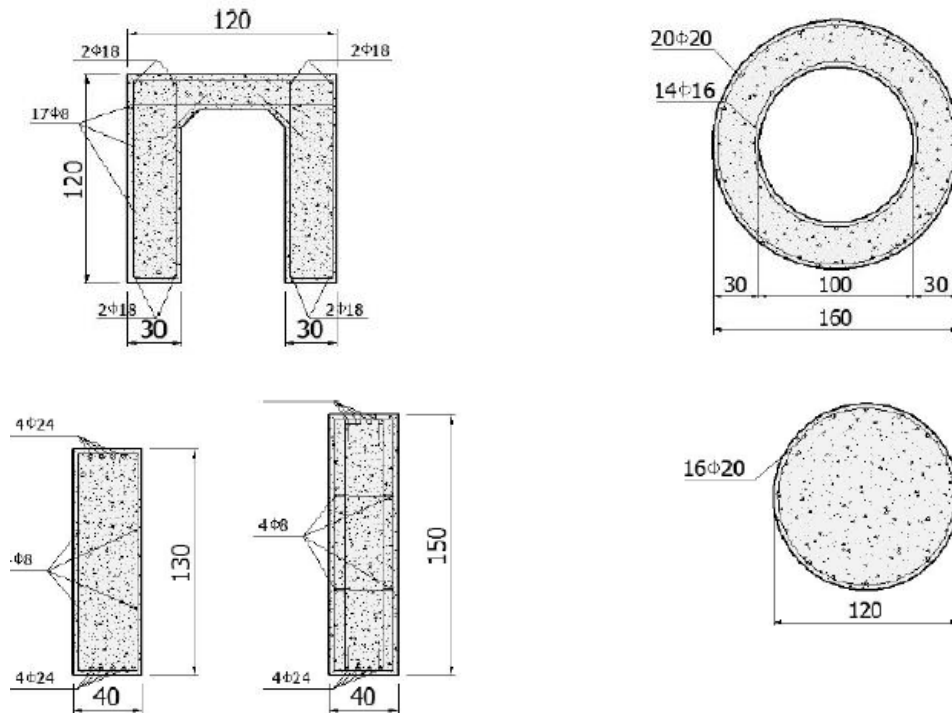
Full-scale cross-sections of the transverse, the cap-beam, and the columns
